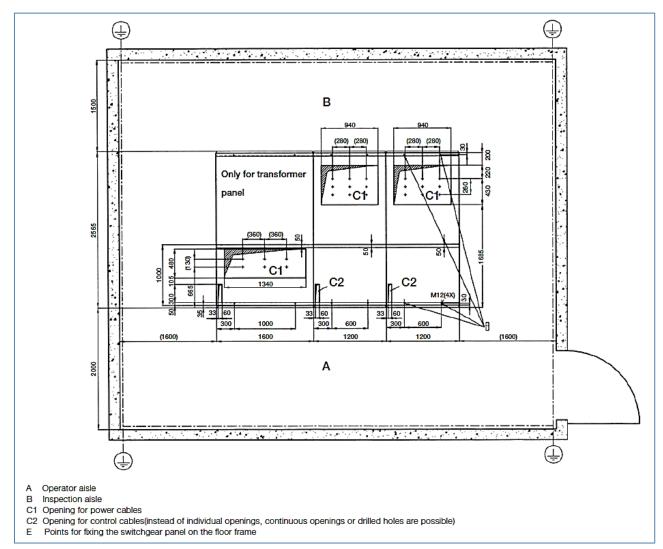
Guideline structural data for foundation frame in concrete floor.
